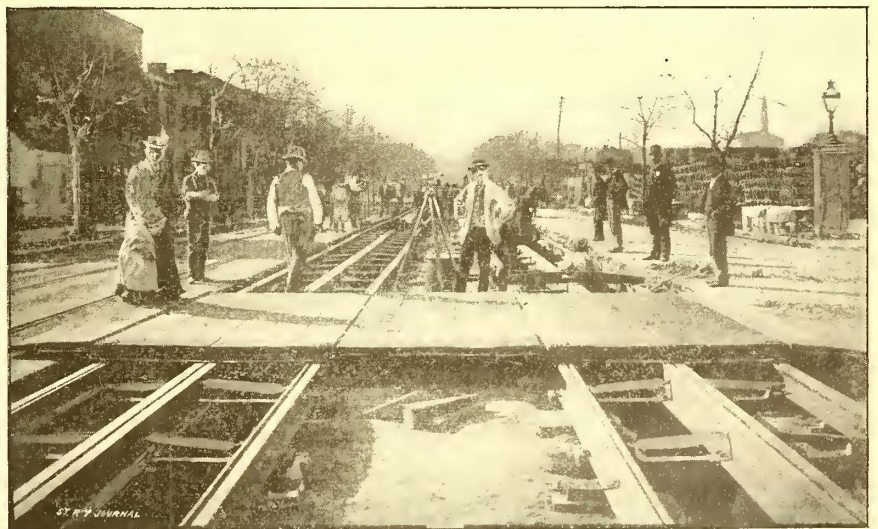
CABLE CONSTRUCTION, SHOWING TEMPORARY HIGHWAY BRIDGES—COLUMBIA RAILROAD.
